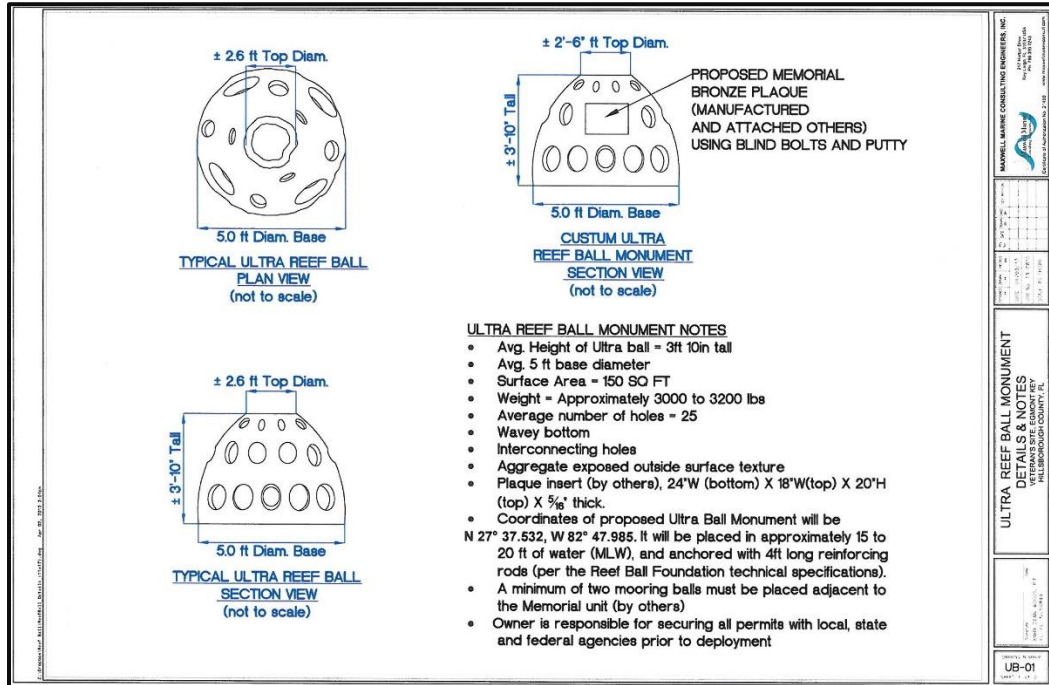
Plans for concrete monument (Maxwell Marine Consulting Engineers).
